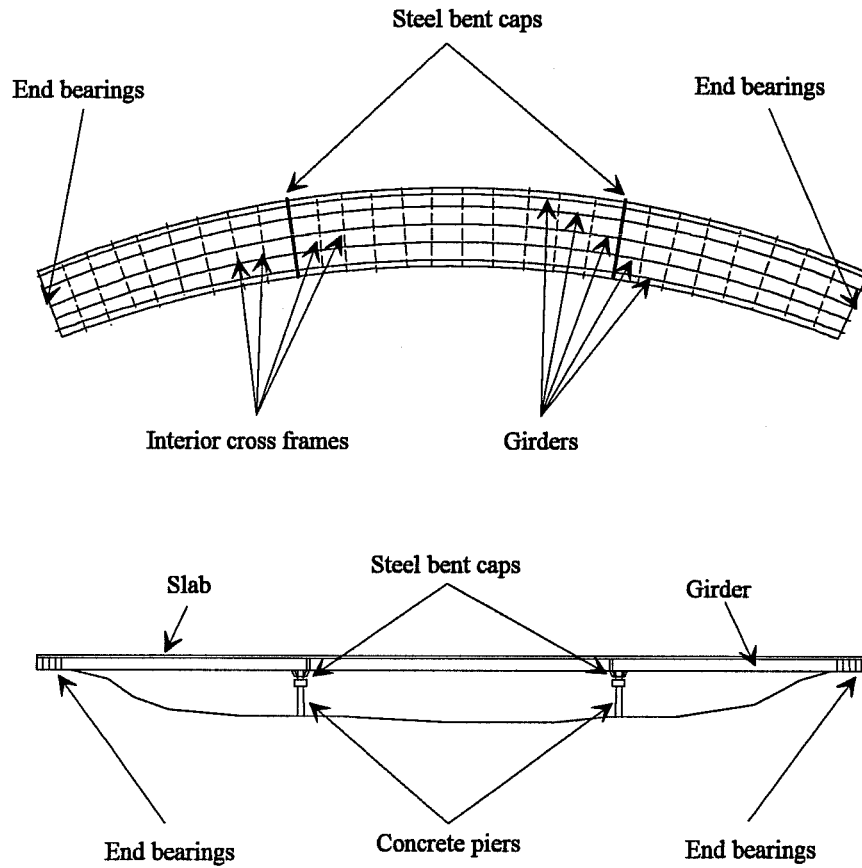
Plan and elevation views of a horizontally curved steel bridge
